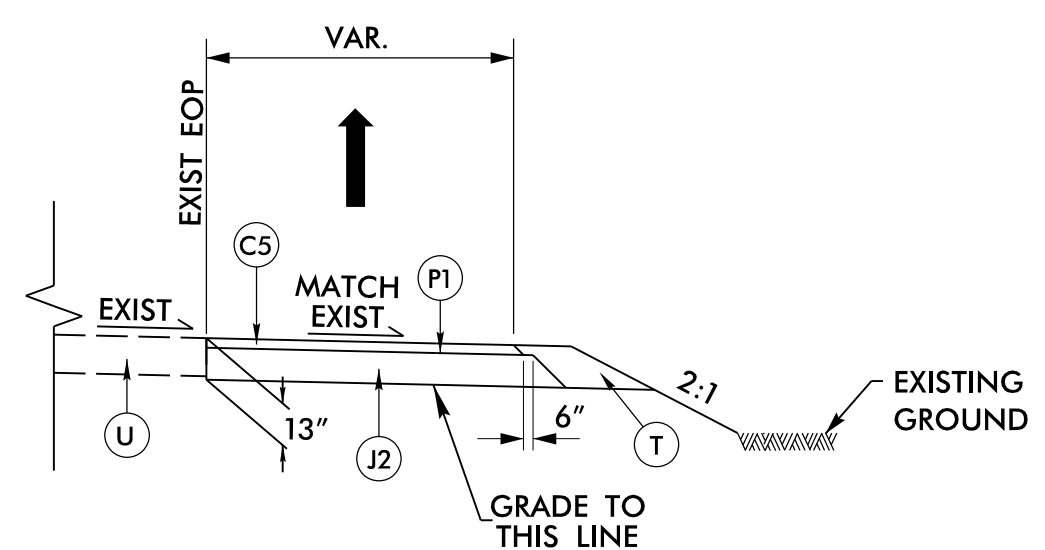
TEMPORARY CROSSOVER PAVEMENT
